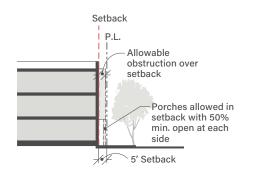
Type C – West Street and San Ramon Paseo Setback
